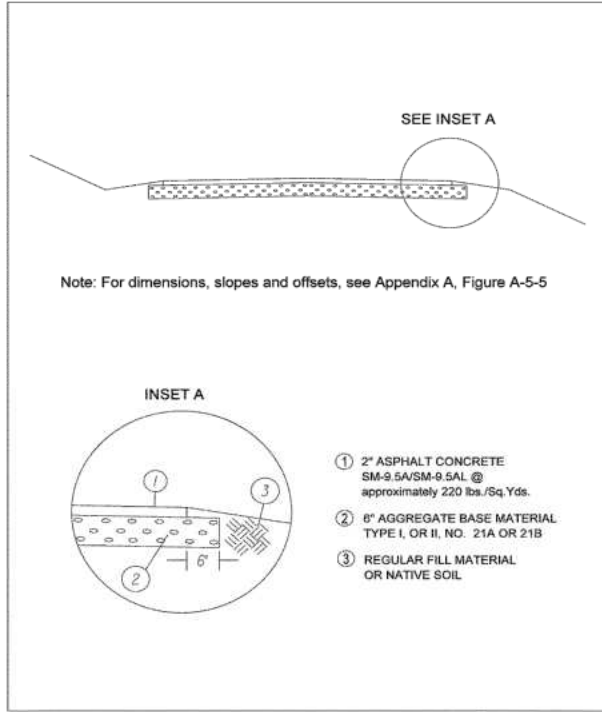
SHARED USE PATH PAVEMENT STRUCTURE\
